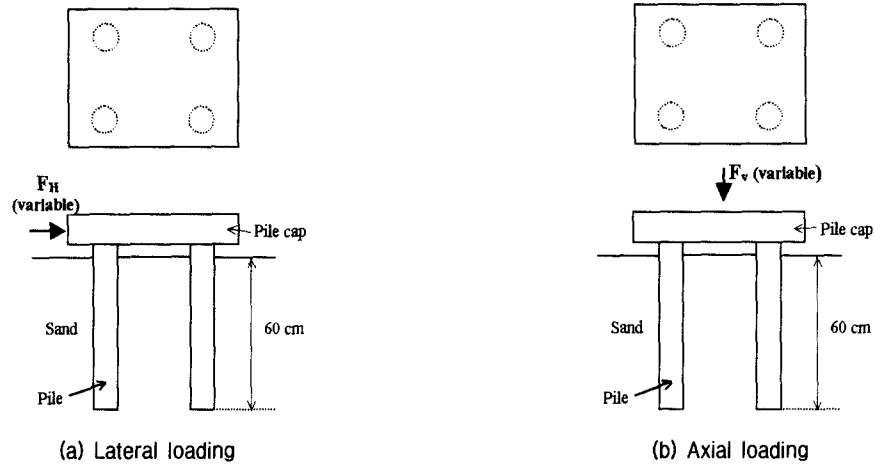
Test pile group configurations (Chung and Jeong, 2001)
